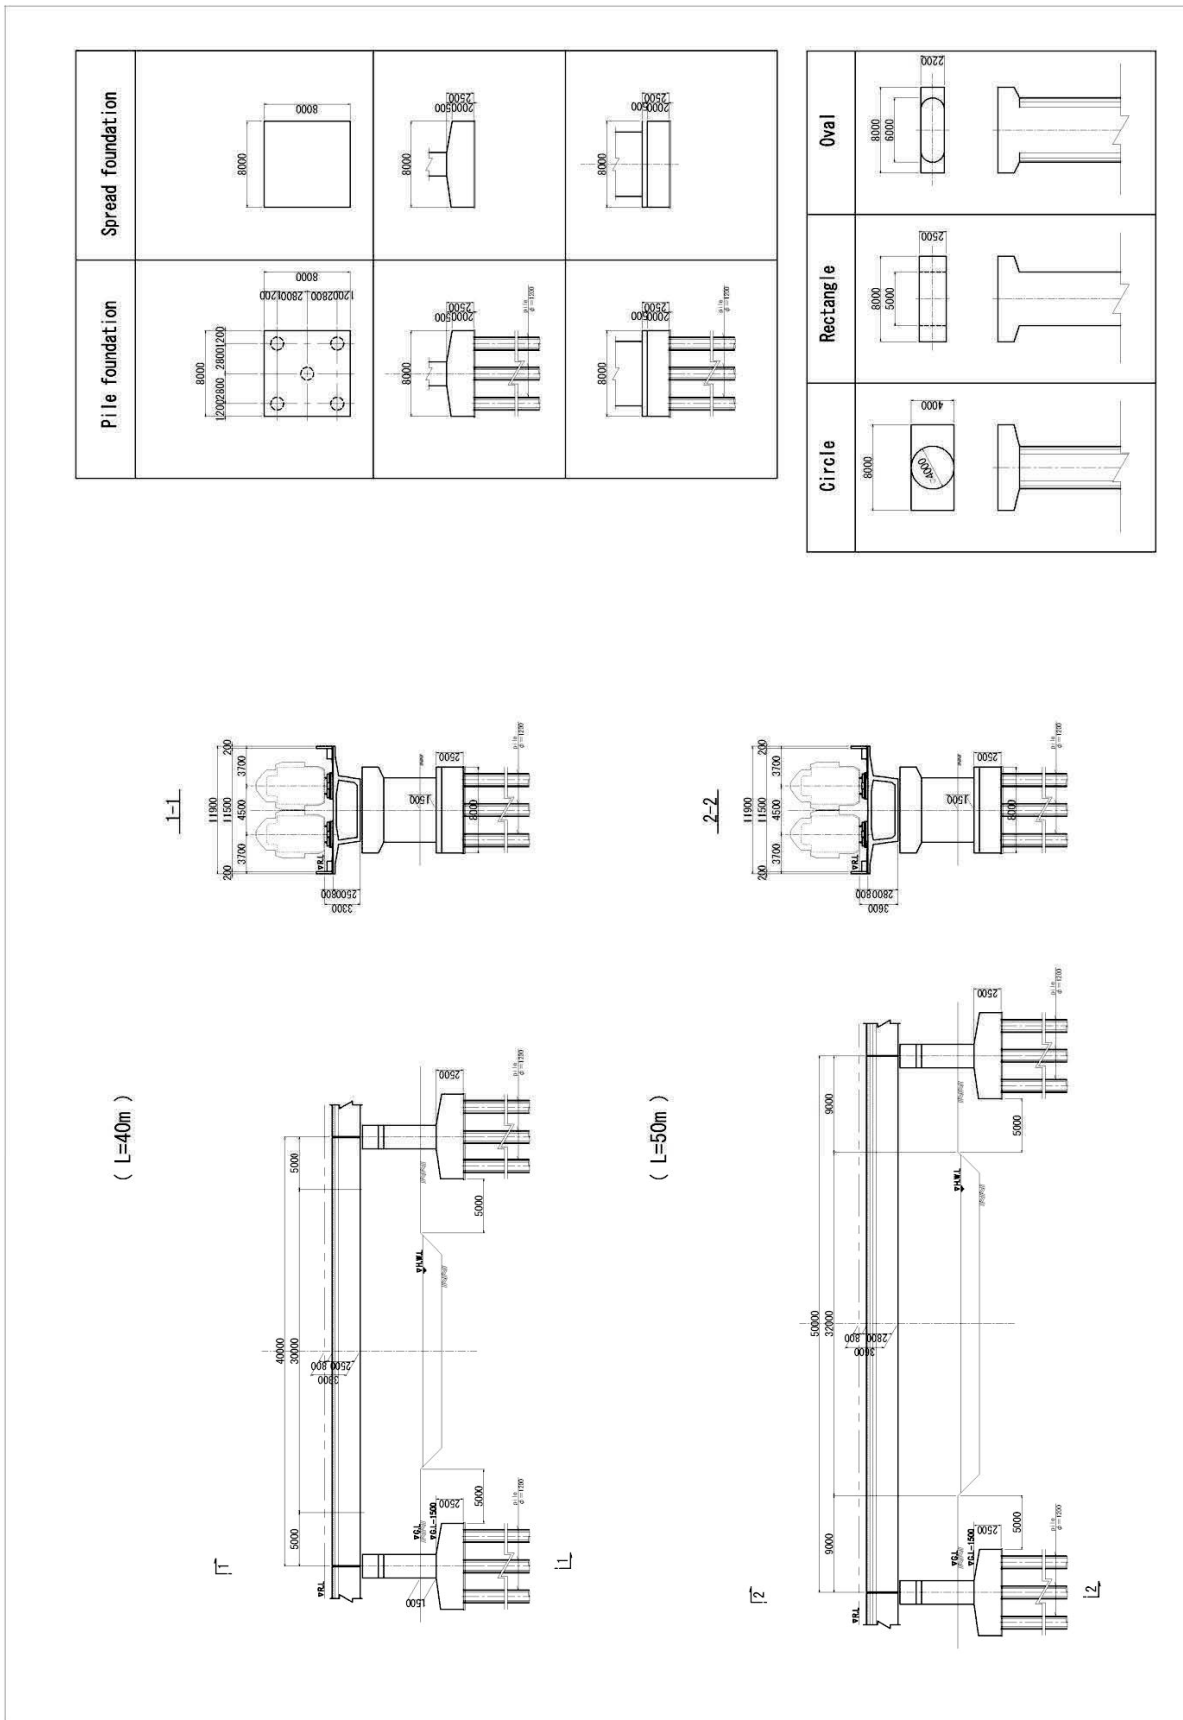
Drawing of Standard Structure Type for Bridge, Simple-girder, 1-span(2)
